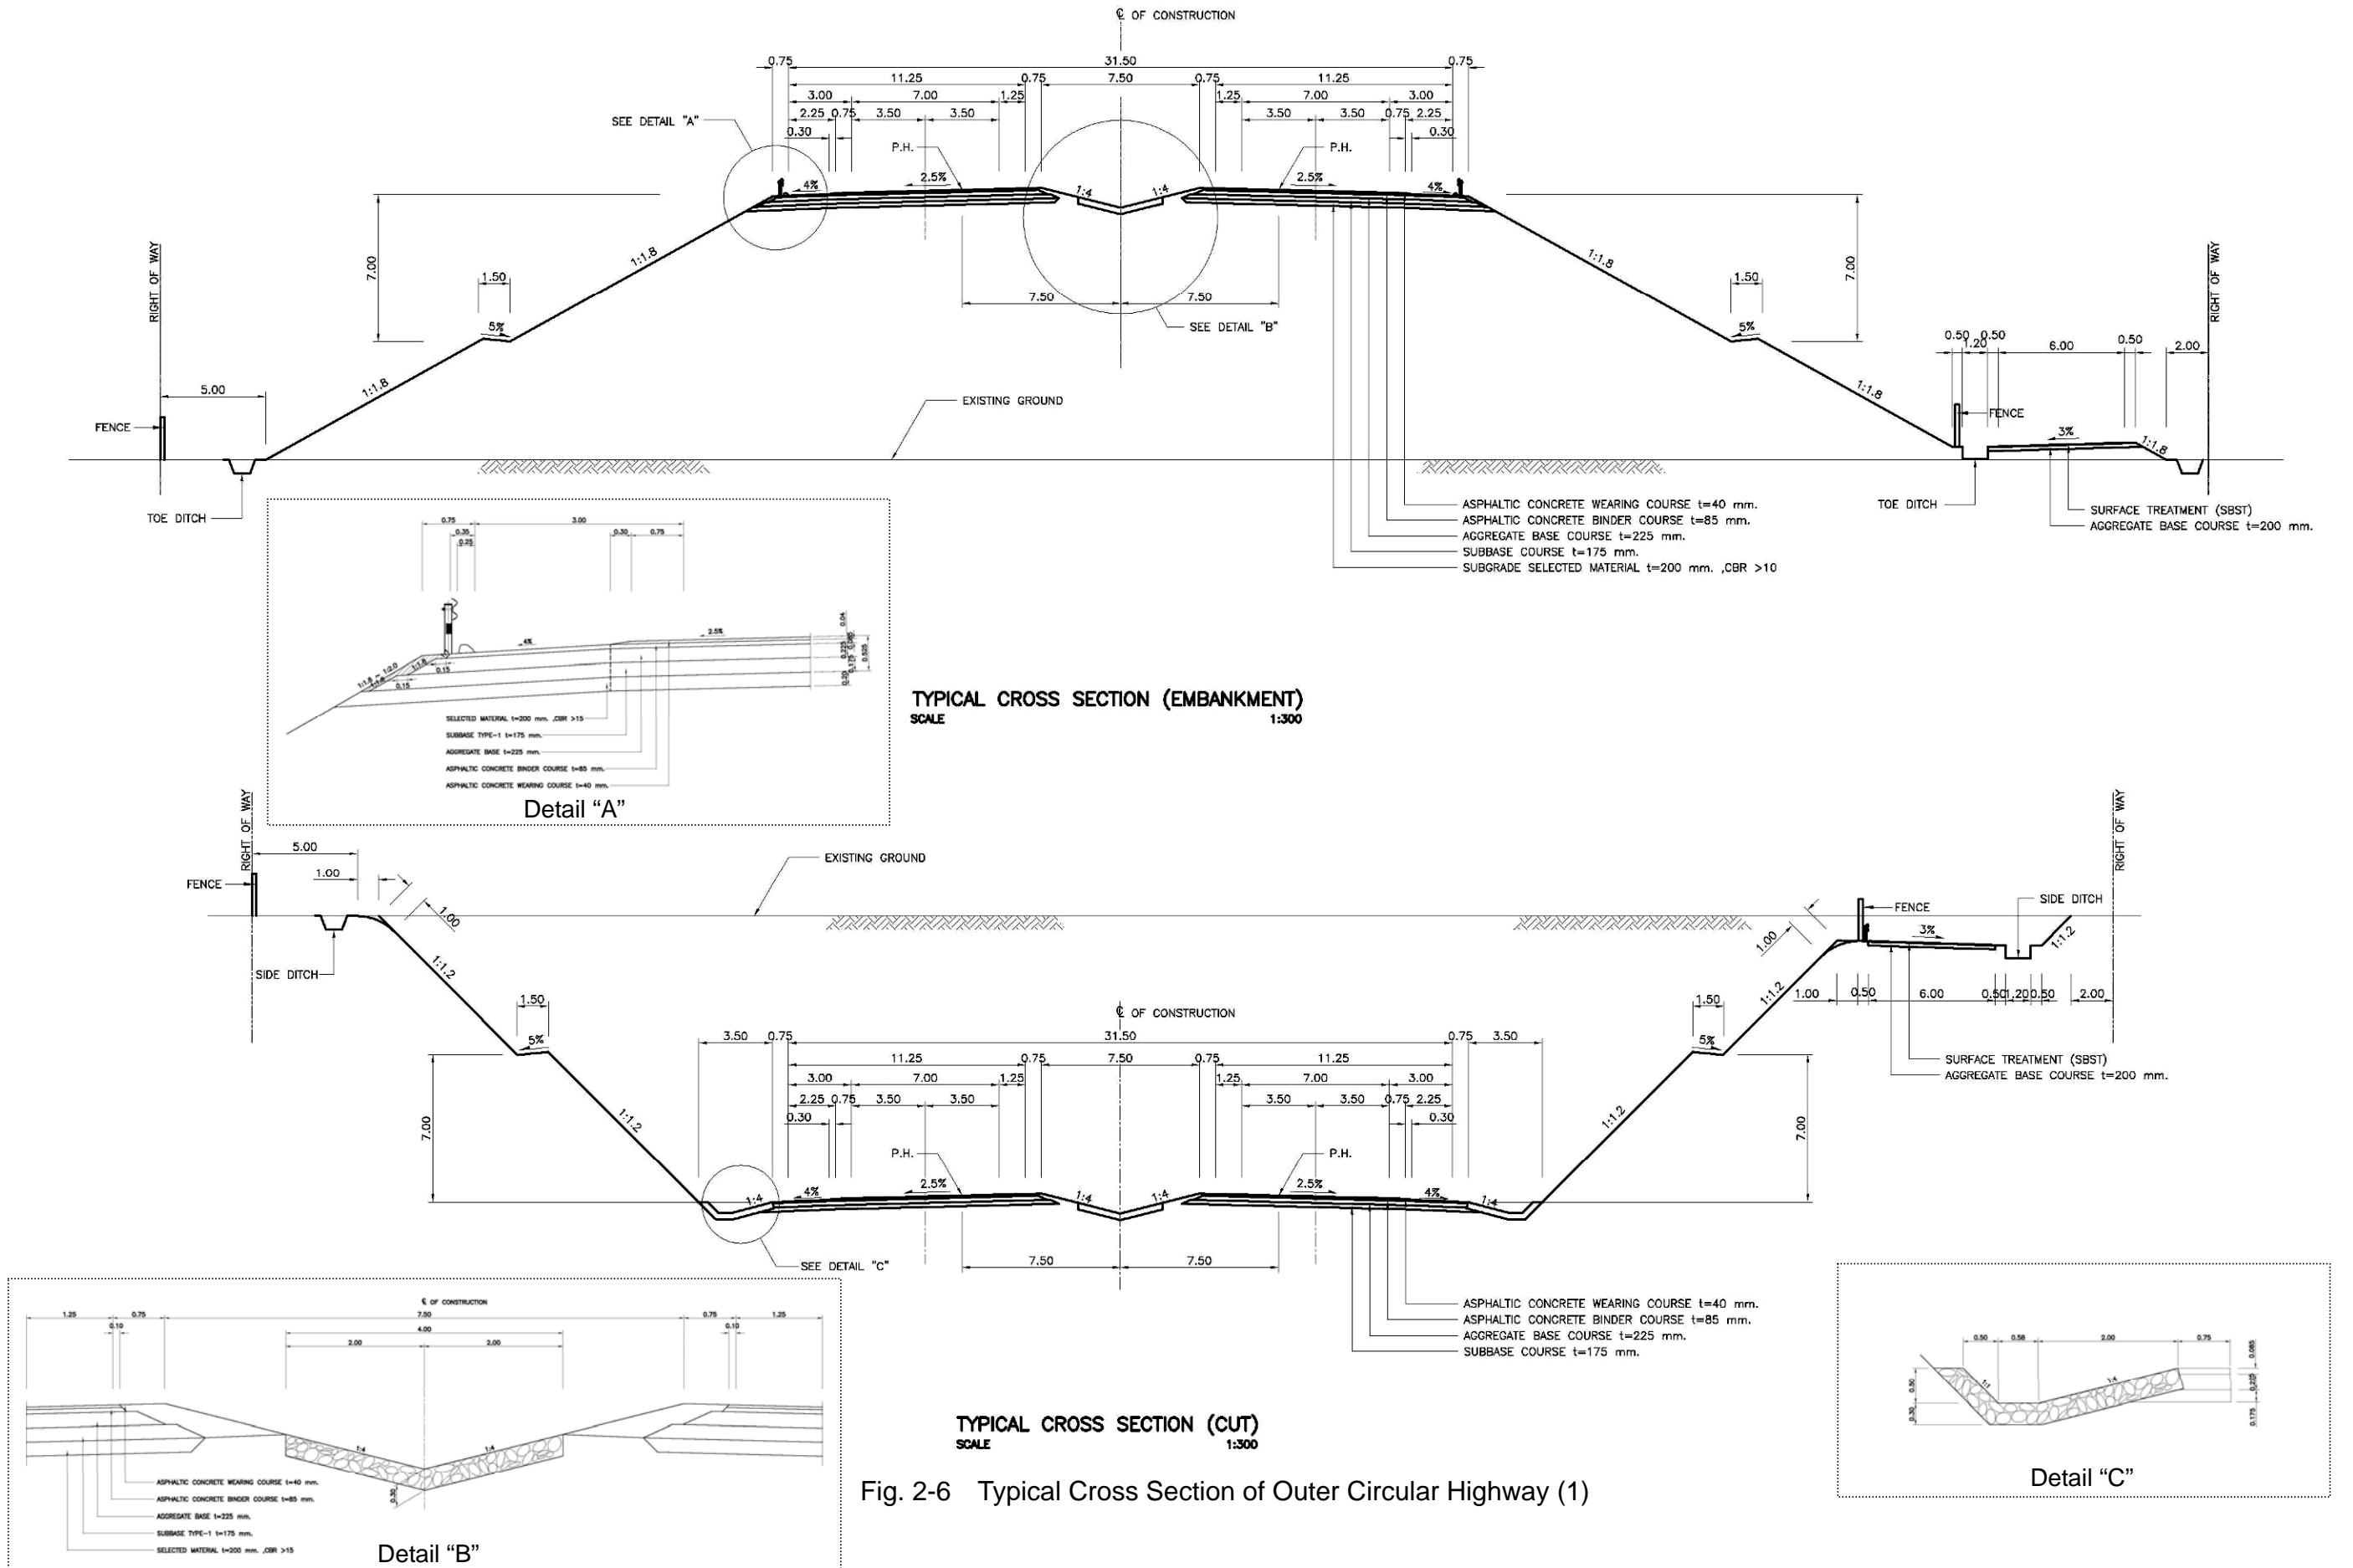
Typical Cross Section of Outer Circular Highway (1)
